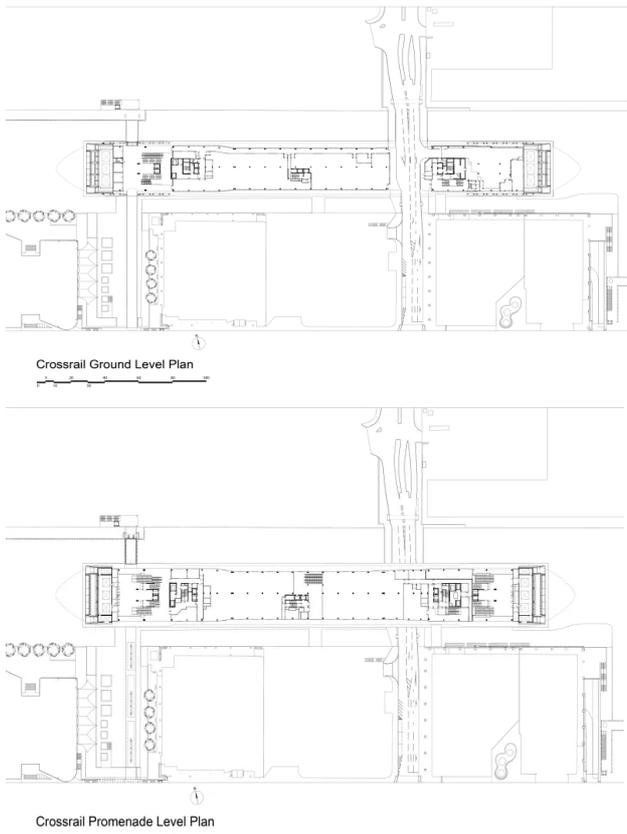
Ground and Promenade Level Plan of the Crossrail Station
